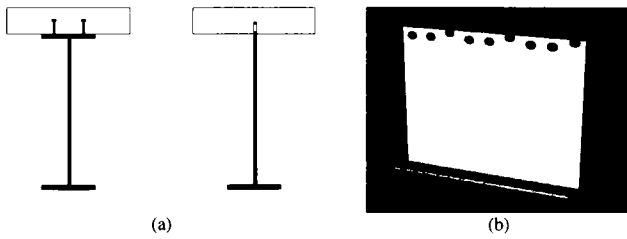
(a) Comparison of traditional and new composite cross sections; (b) inverted steel T-section used in the new cross section.
